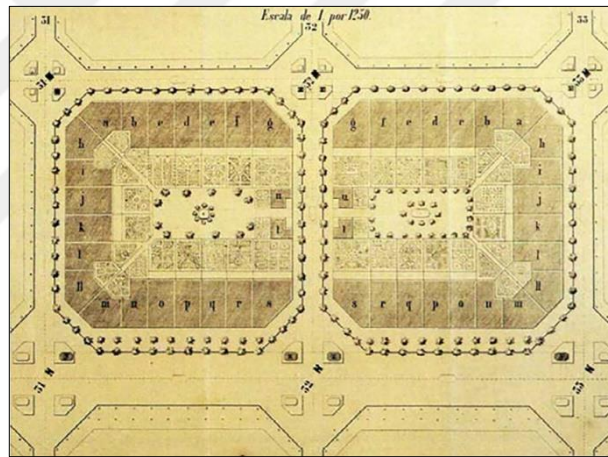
Cerda's modular city plan (Failed Architecture, 2014)
